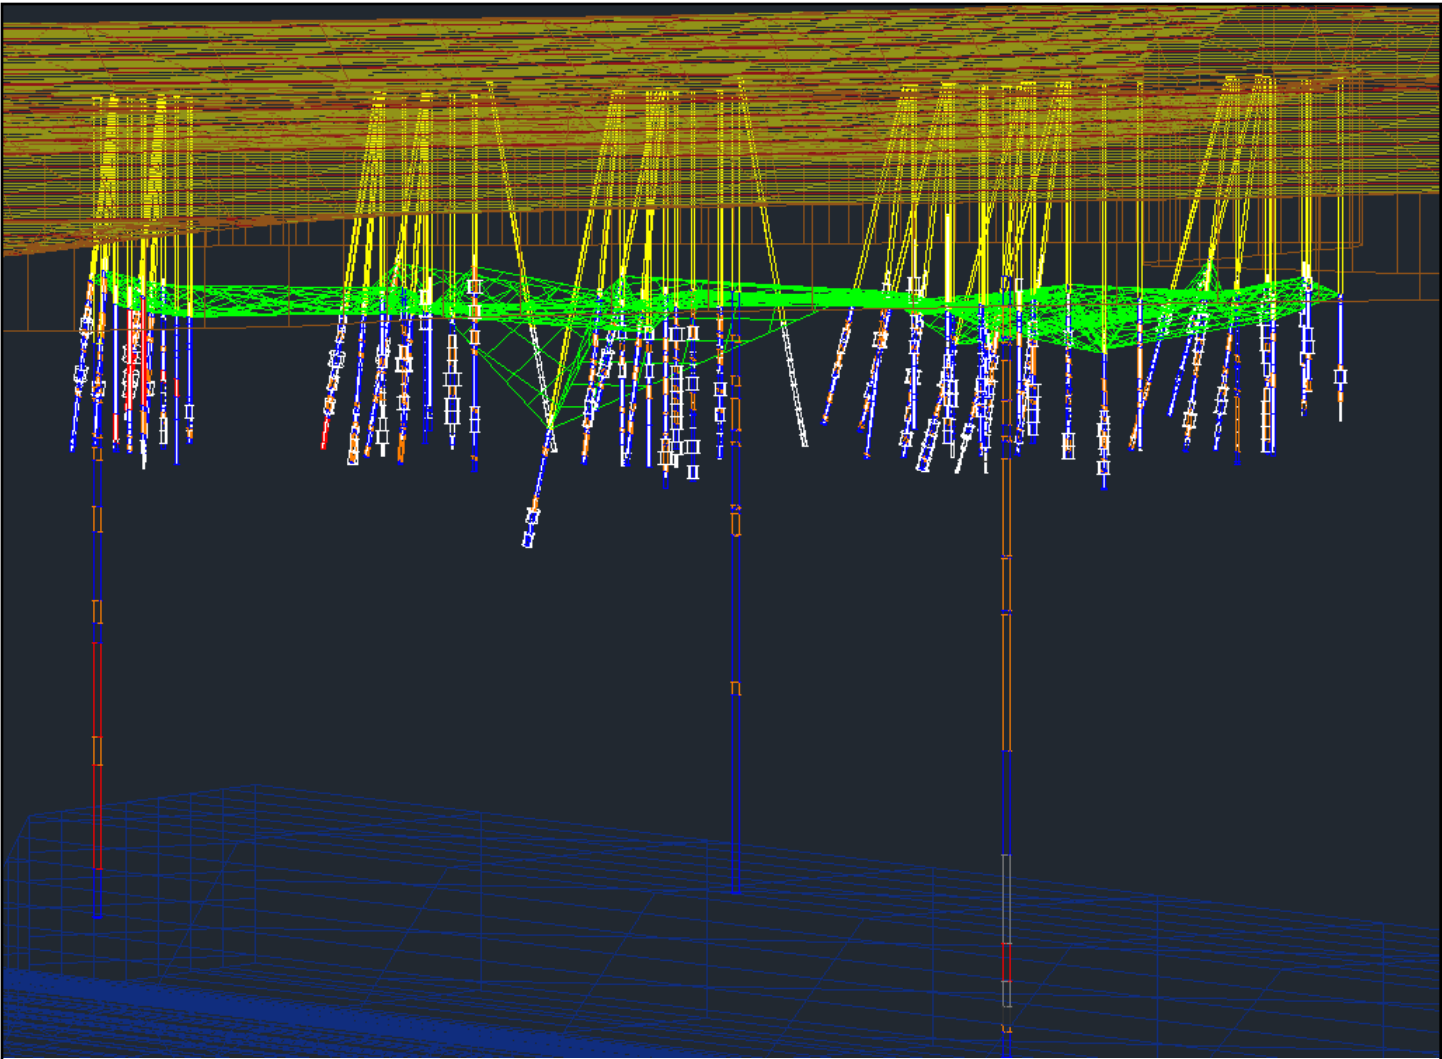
3-D GEOLOGIC MODEL IMAGE BASED ON COMPLETED DRILLING AND GROUTING BENEATH THE EAST EMBANKMENT TOE. (NOTE TOP OF ROCK DEPICTED IN BRIGHT GREEN.)
